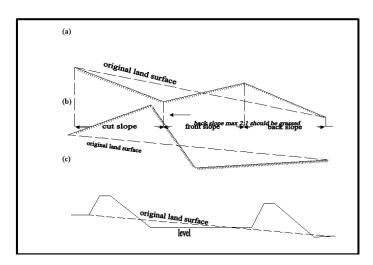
Typical terrace cross section; a- broad base, b- steep backslope, c- bench.
